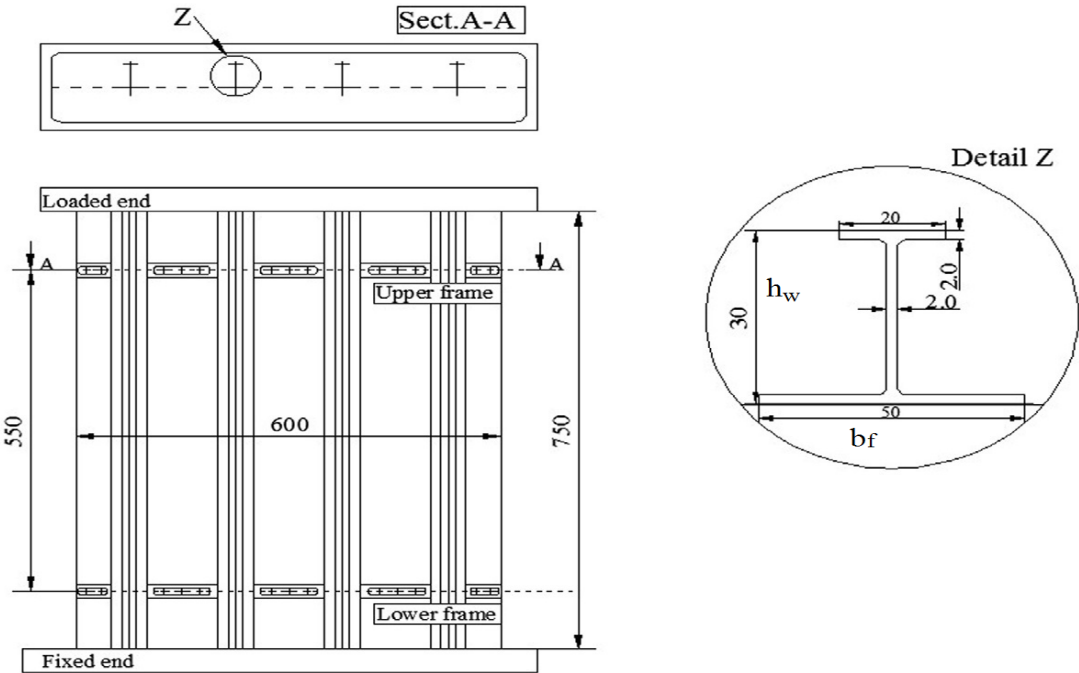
Configuration of stiffened panel with I-shape stiffeners used by Wang et al. [38].
